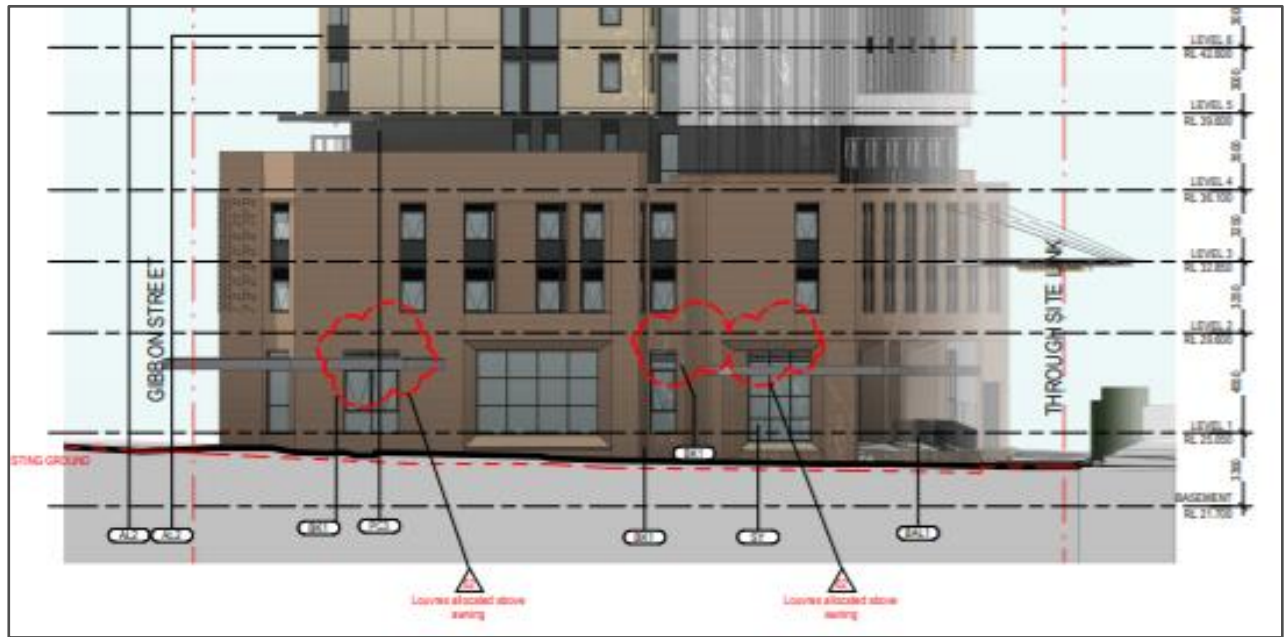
| South elevation plan (external louvres proposed are shown in red clouds on ground floor). (Source: submitted architectural plans).
